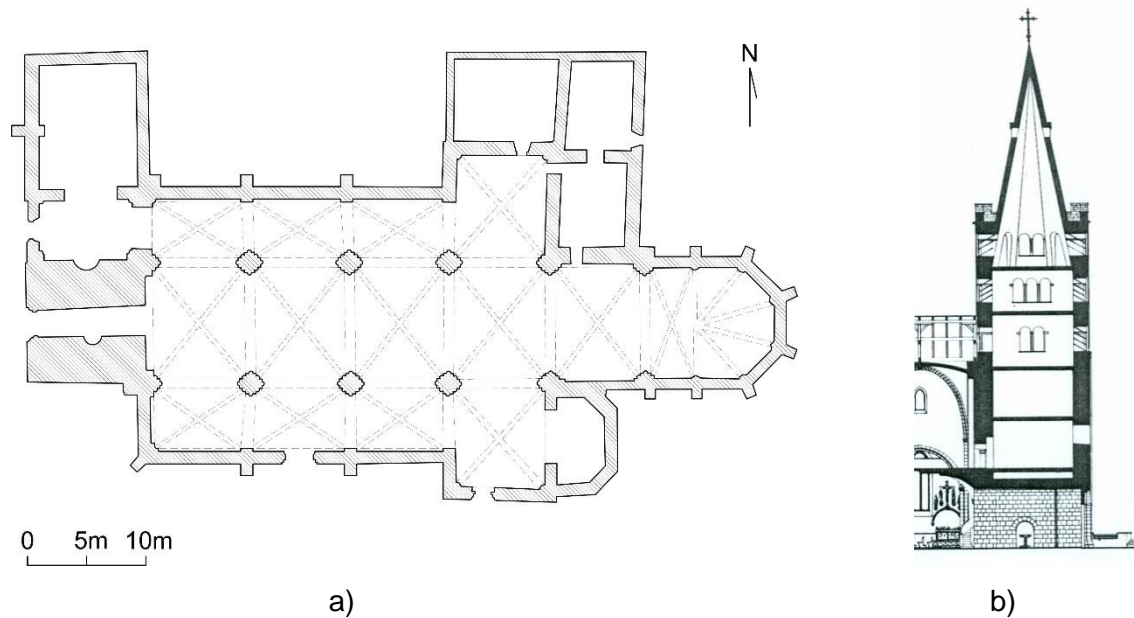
Plan (a) and cross section of the bell tower (b) of Sion Cathedral
